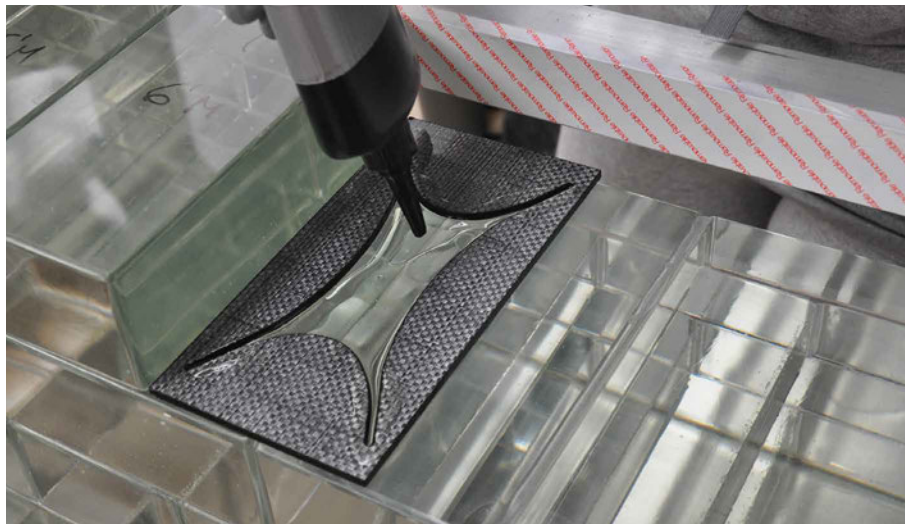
PURE*[®] mould used for the application of the adhesive on the final façade wall.
